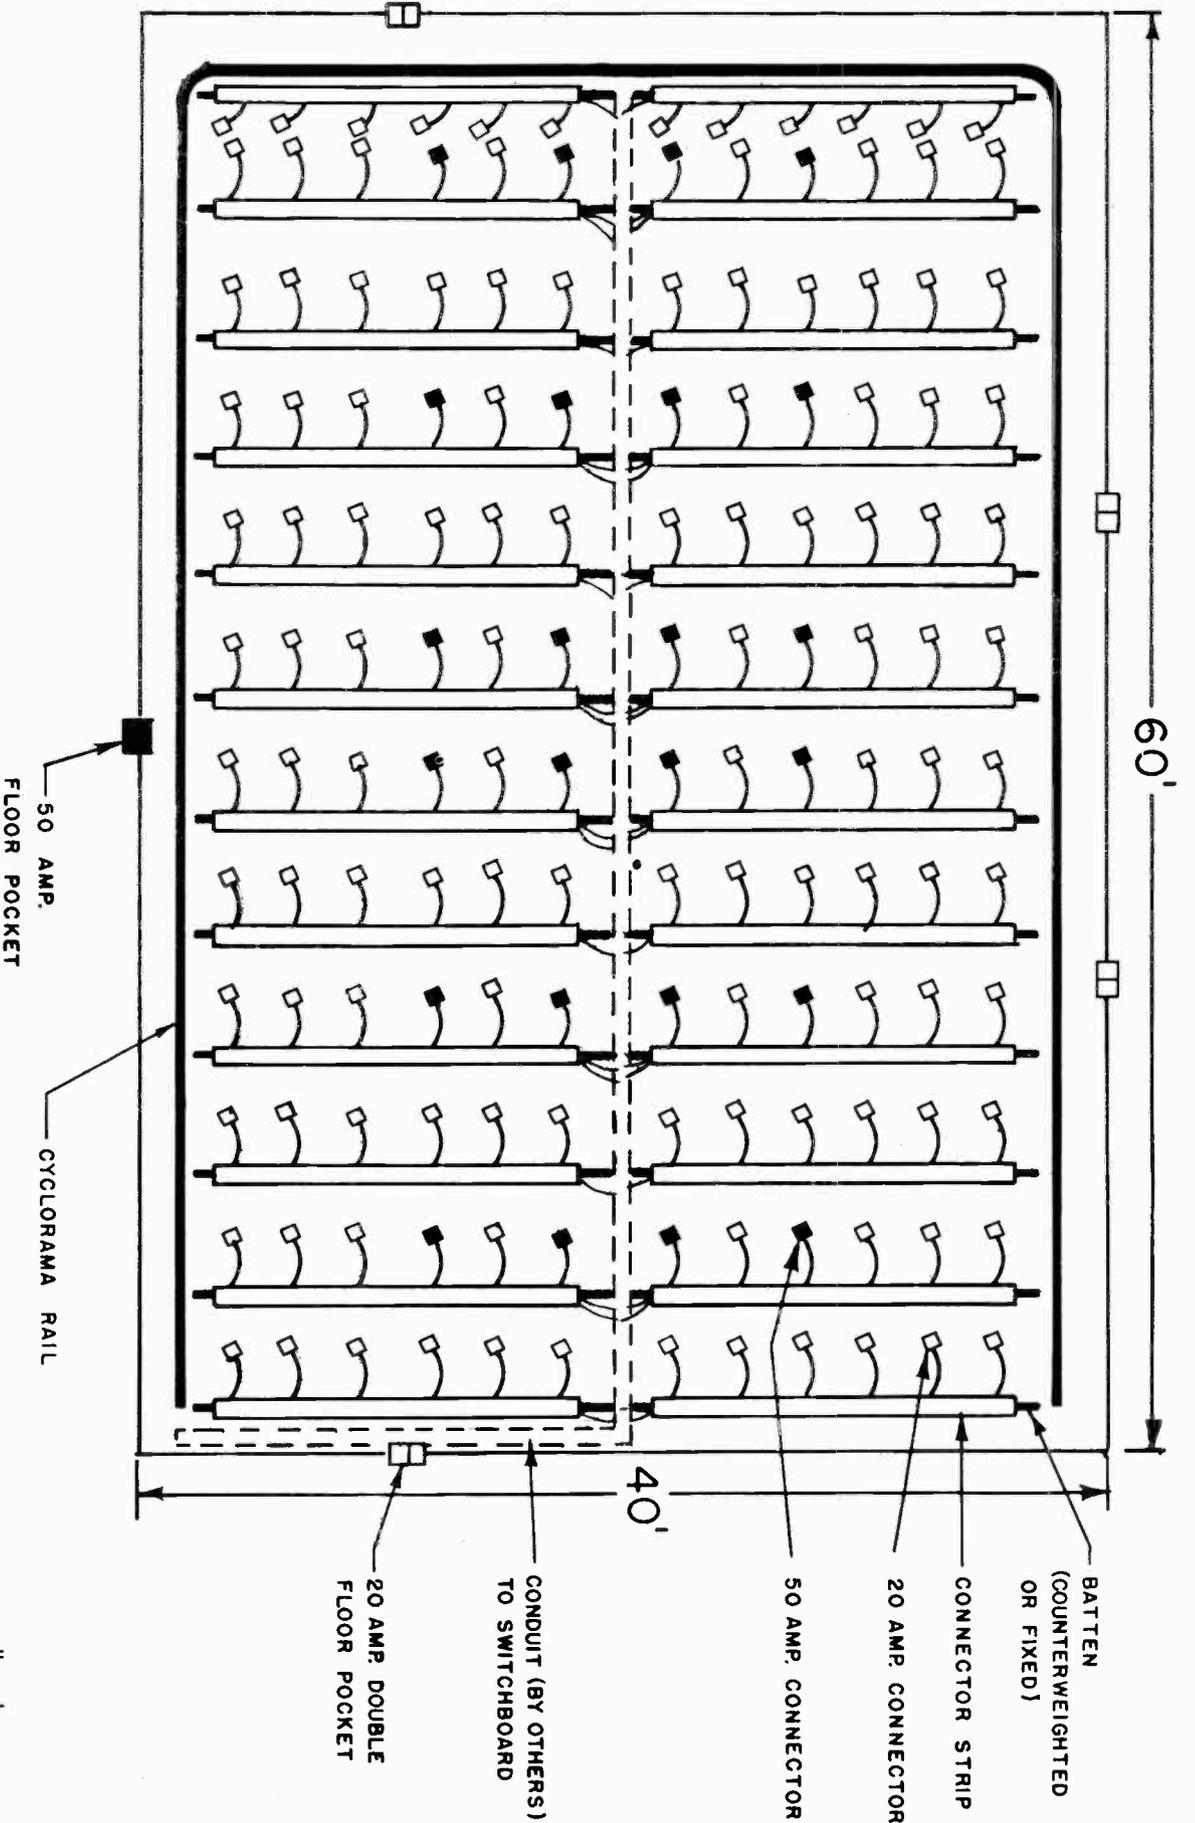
Typical connector strip layout for a 40' x 60' T.V. Color Studio.
